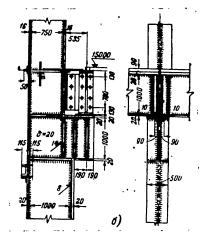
Connection of a crane girder and a frame girder to a column.
